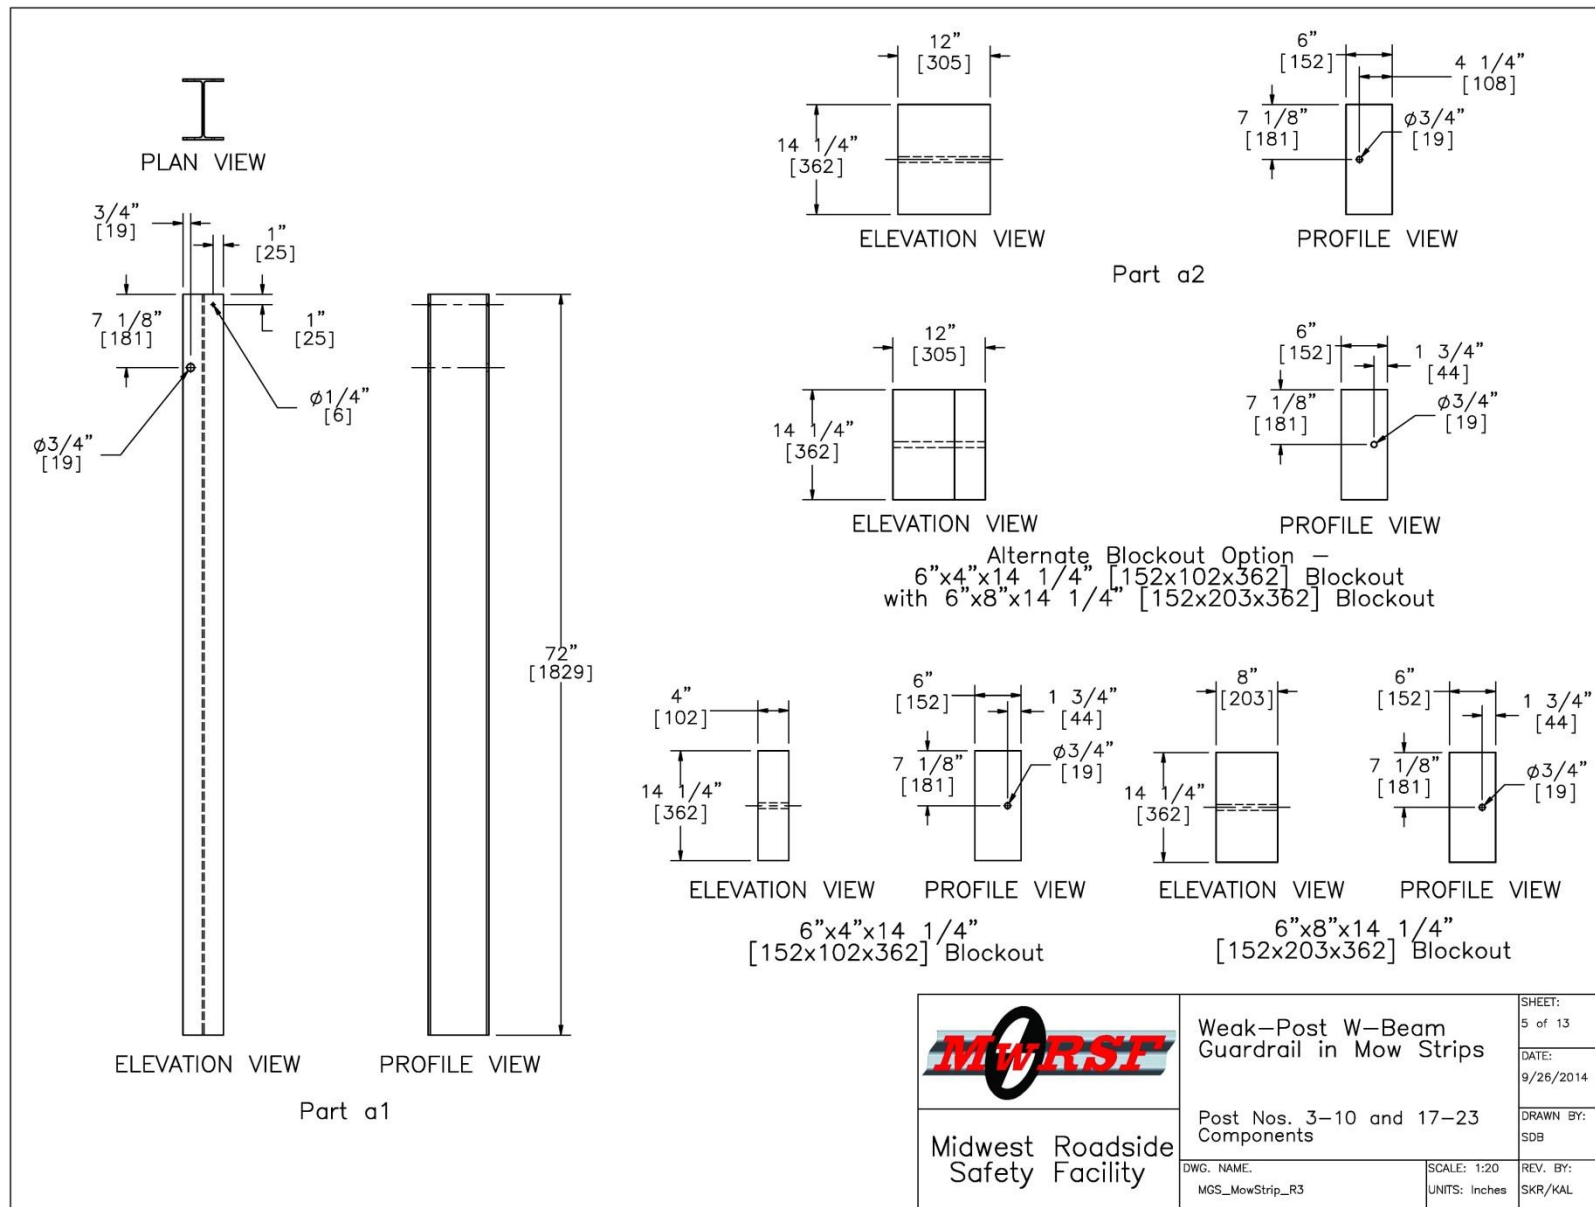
Post and Blockout Details, Test No. MGSMS-1
